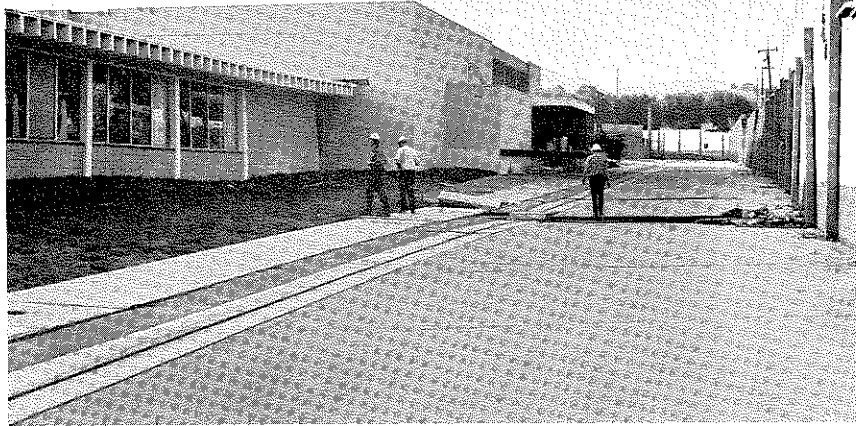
Ground displacement and structural damage near northern boundary of San Fernando Juvenile Facility.
